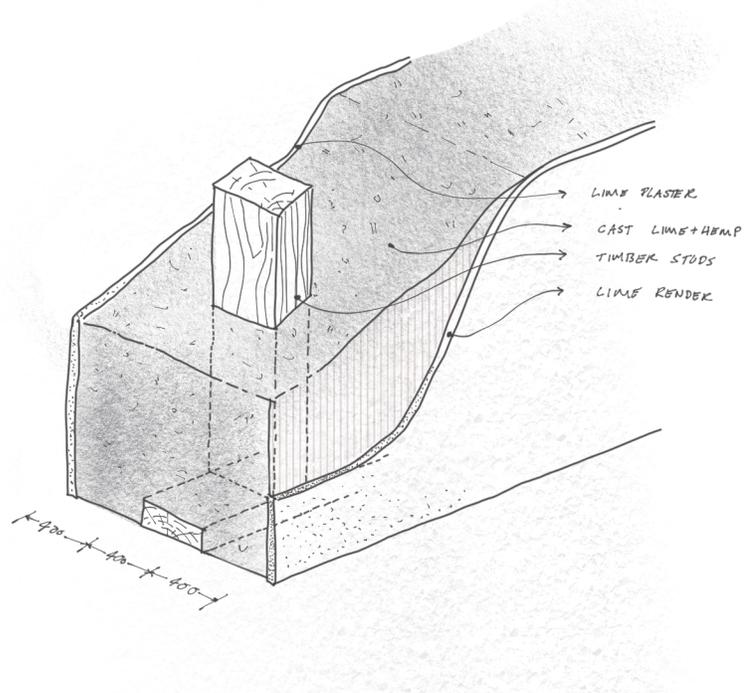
Hempcrete filled wall with 2x4 stud framing.
